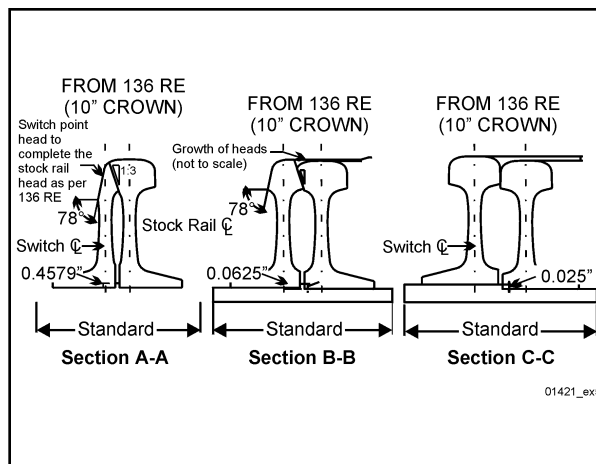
Cross section Views of Proposed Switch Point Concept
